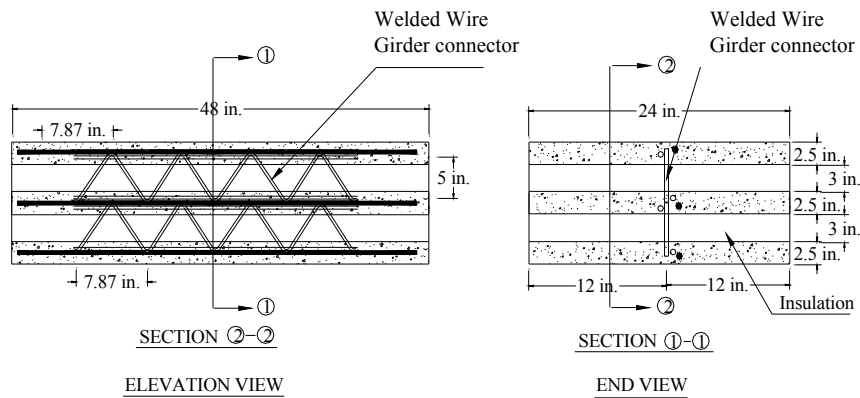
Details of 2 ft. by 4 ft. by 13.5-inch push-off specimens, welded wire girder connectors
